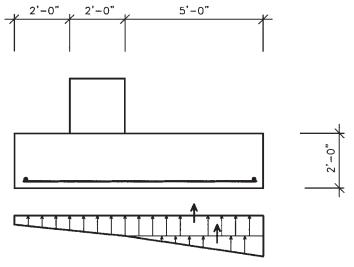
Soil pressures under column footing in Case 1 of Example 12.1.
